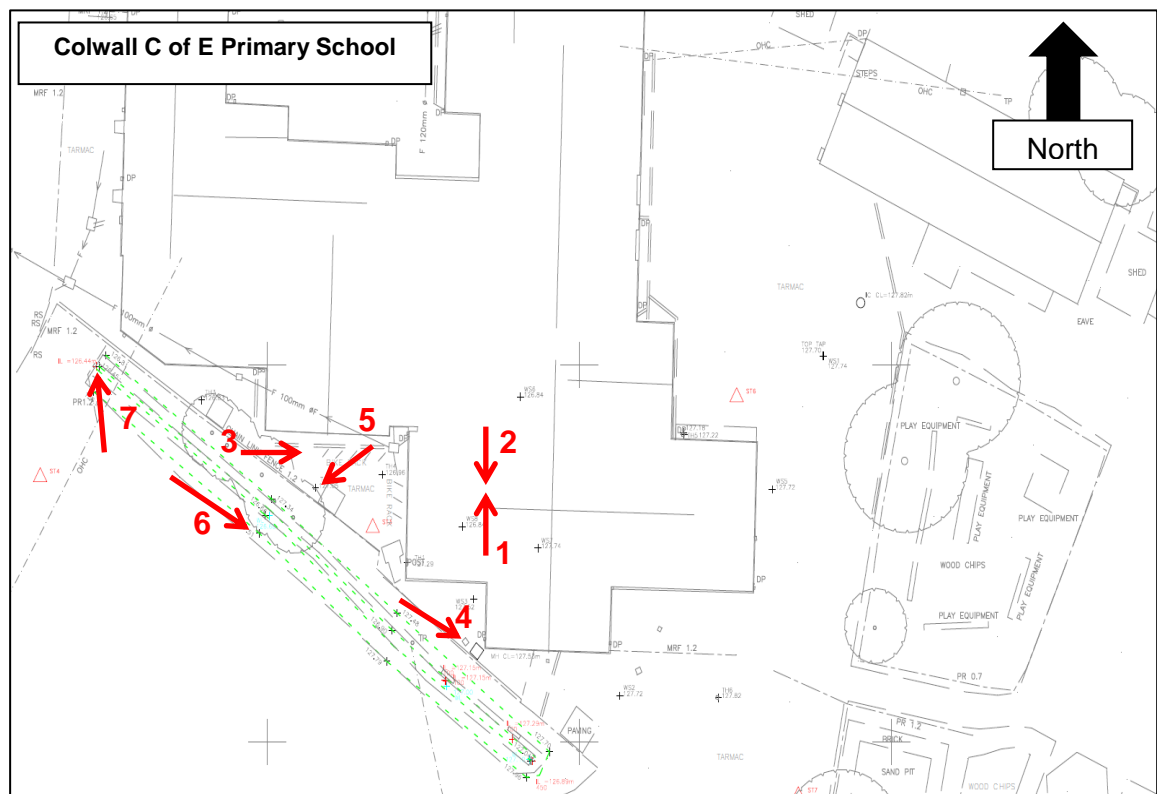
Site Walkover Photograph Location and Direction – Wider Area
